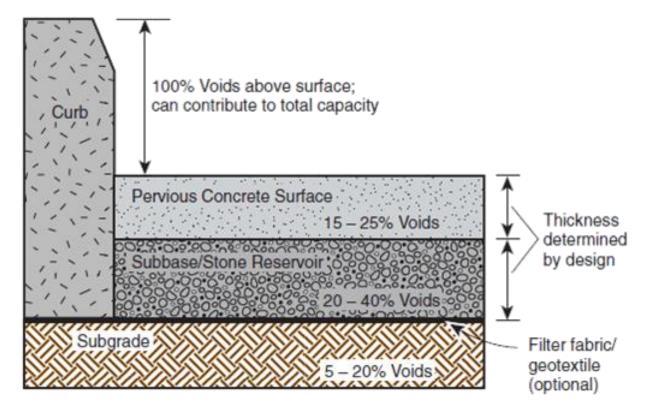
Typical cross-section of permeable concrete pavement. (Source: ACPA Concrete Pavement Wiki, https://wikipave.org/index.php?title=Pervious_concrete_pavement).
